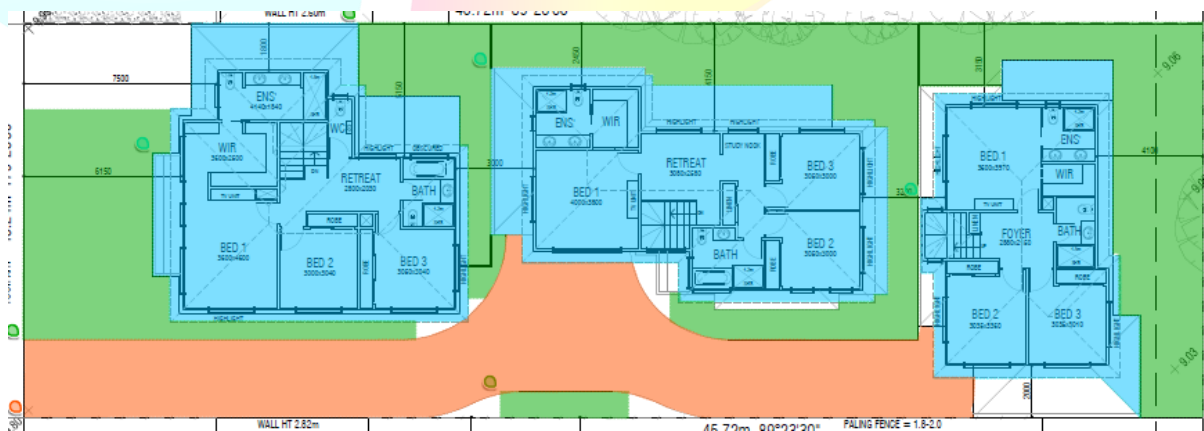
Roof catchment (blue) / Landscaped areas (green) / Area excluded (black) / Untreated areas (white) / Potential driveway area in which a part (30sqm) will be permeable (orange)
